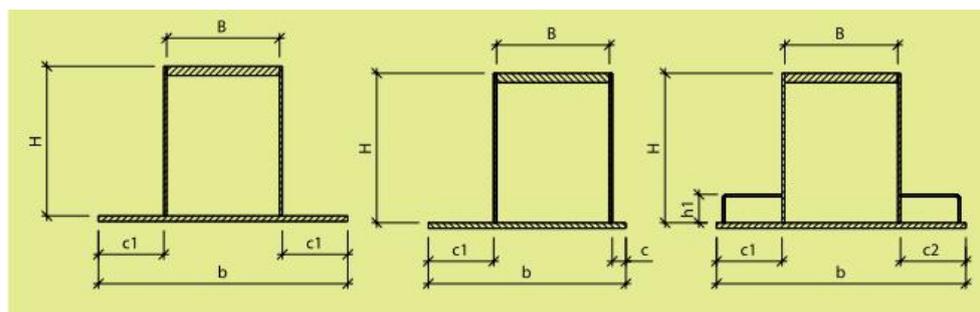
Cross sections of WQ-beam (<http://www.ruukki.com/Construction/Steel-frame-structures/WQ-beam-system>)
